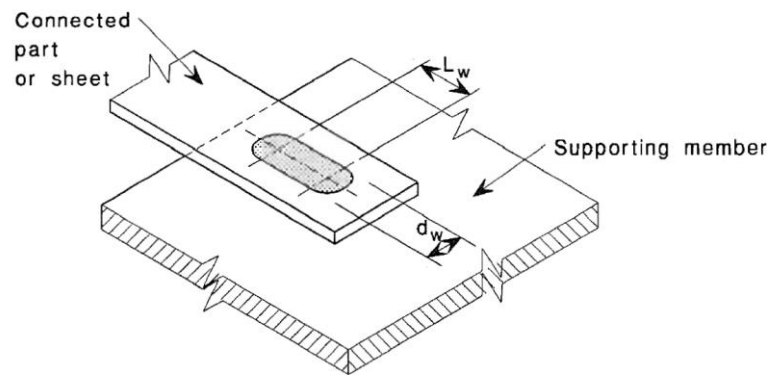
Arc Seam Weld (Elongated arc spot weld) [8].
